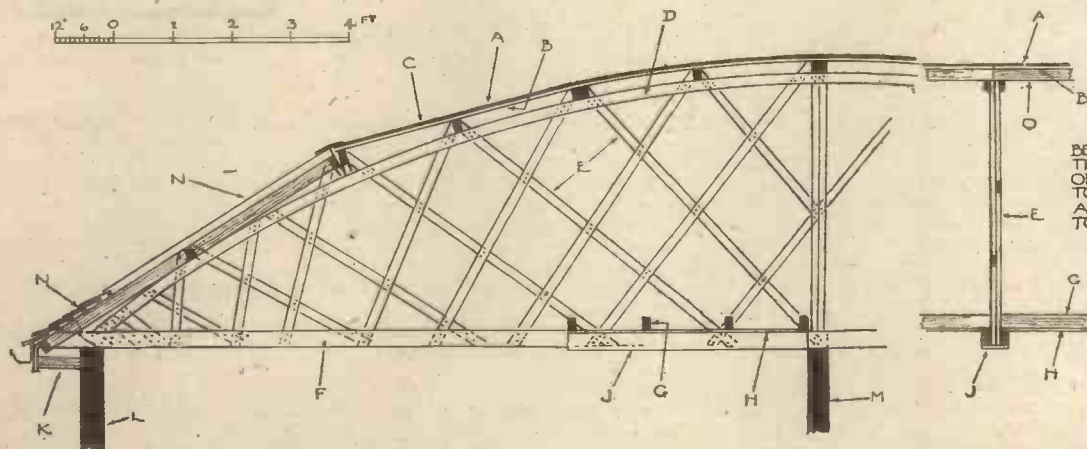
BELFAST TIMBER ROOF TRUSS WITH TILED OR SLATED ROOFING TO EAVES SLOPE AND SHEET ROOFING TO GENERAL SLOPE.
